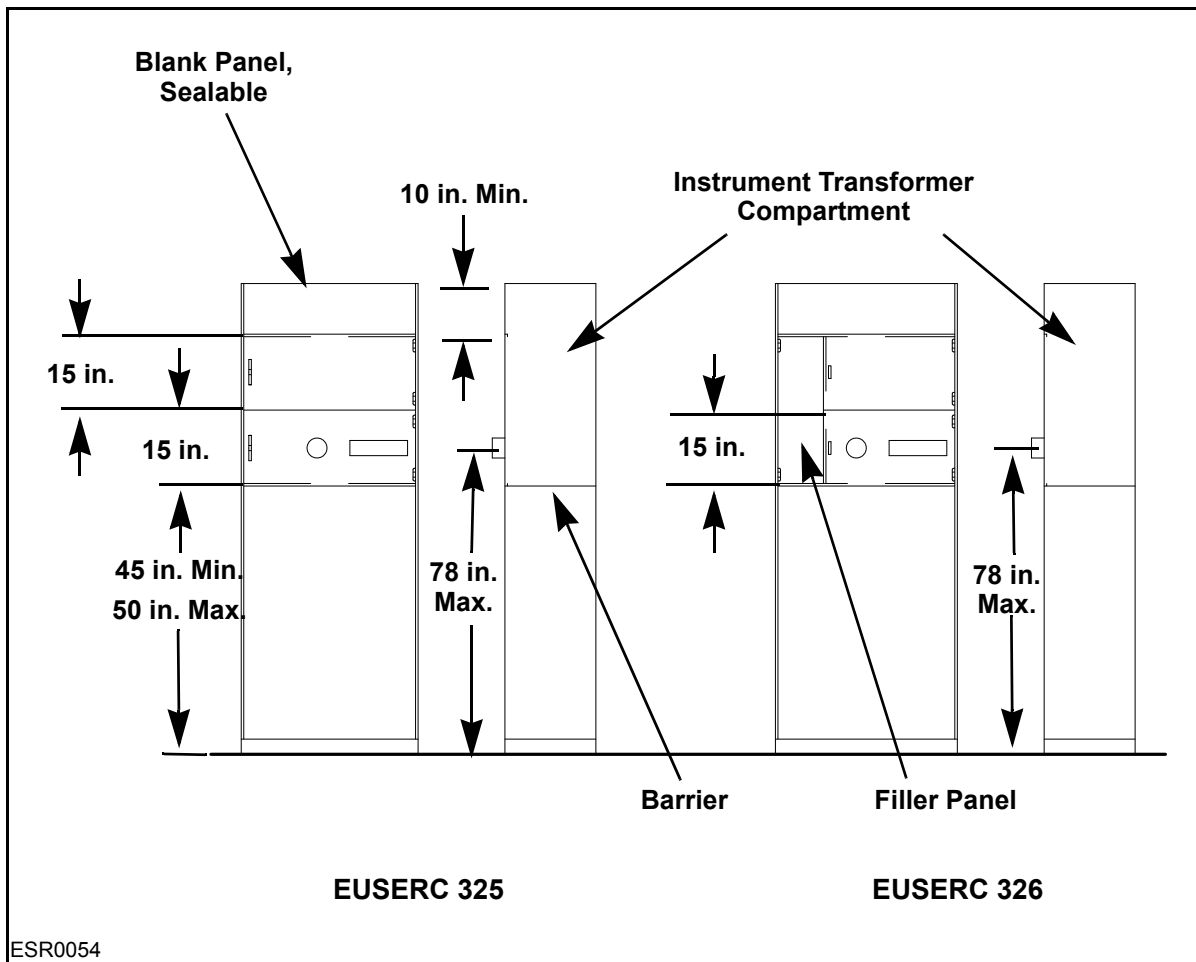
Indoor Switchgear Metering (EUSERC 325 and 326)
